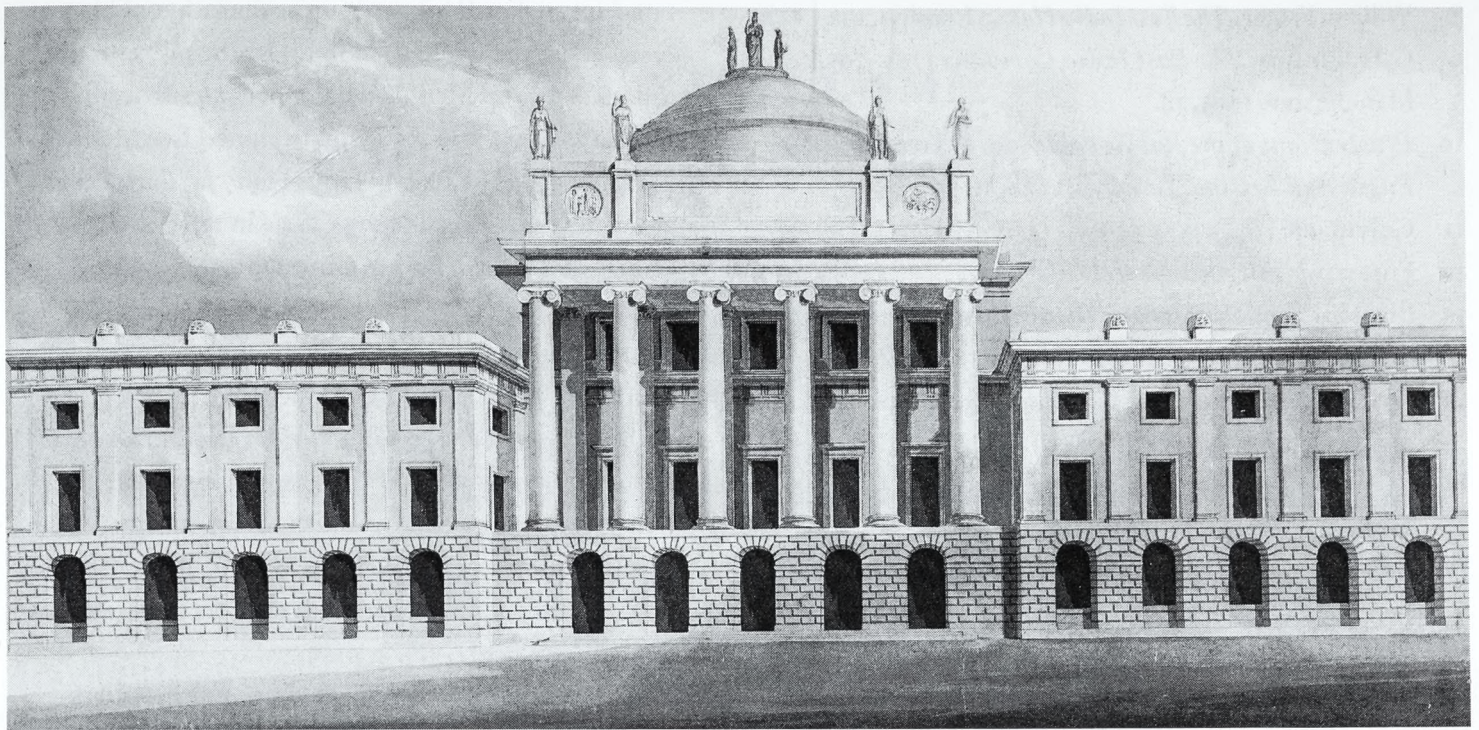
John Soane, East India House, alternative proposal for the Leadenhall Street elevation, 26 October 1798. *Sir John Soane's Museum*.
